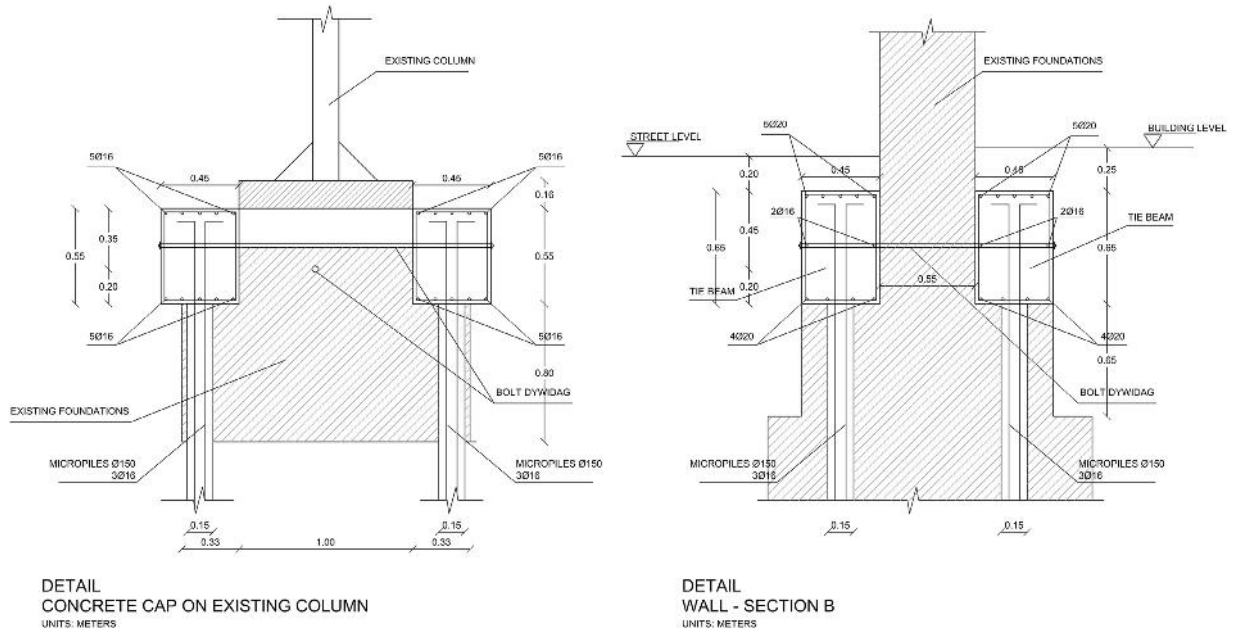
Detail of the micropile underpinning of existing walls' foundation.
